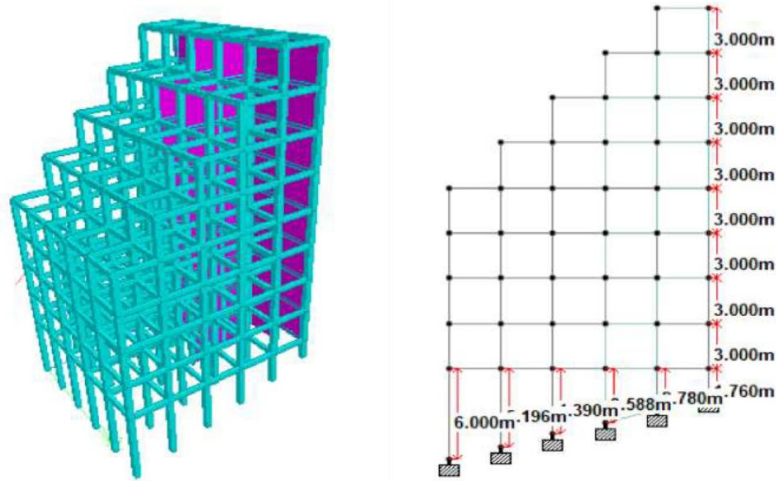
Elevation of T Shape Shear Wall with 15° Slope
